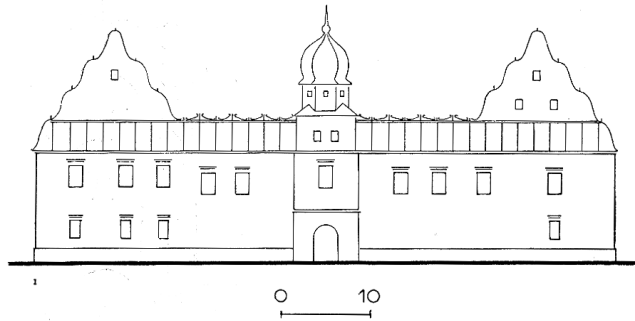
Royal castle in Lobzow: south elevation's reconstruction according to A. Fischinger based on plans from 1595 (source: [9])
